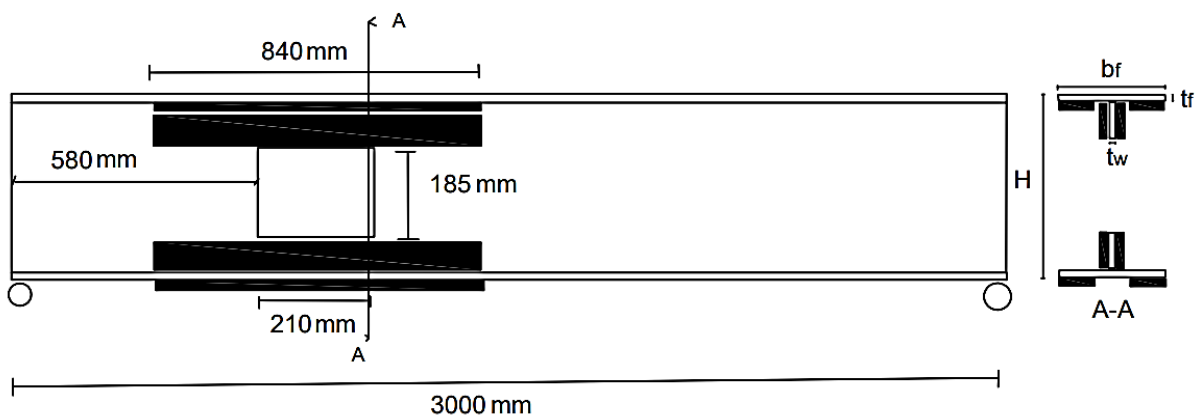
Details and dimensions of HM CFRP strengthened specimen B2-R0.
